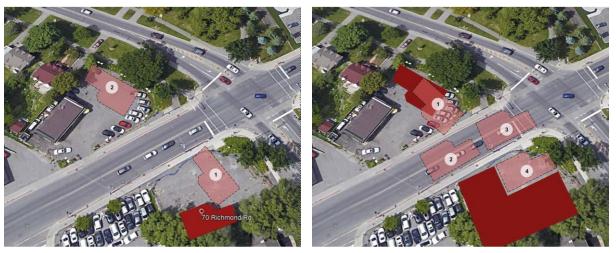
& 7: Diagram of the planned sequence of moves prior to the construction of the apartment midrise and post construction bringing the Station back on site and positioning. CDS House Movers Inc 2023.
